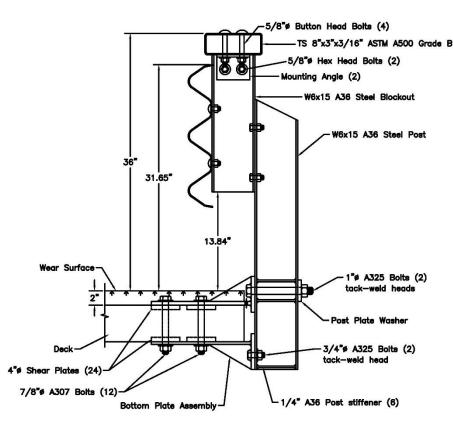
NCHRP Report 350 TL-4 STTR Bridge Rail for Transverse, Glulam Timber Decks [18]
